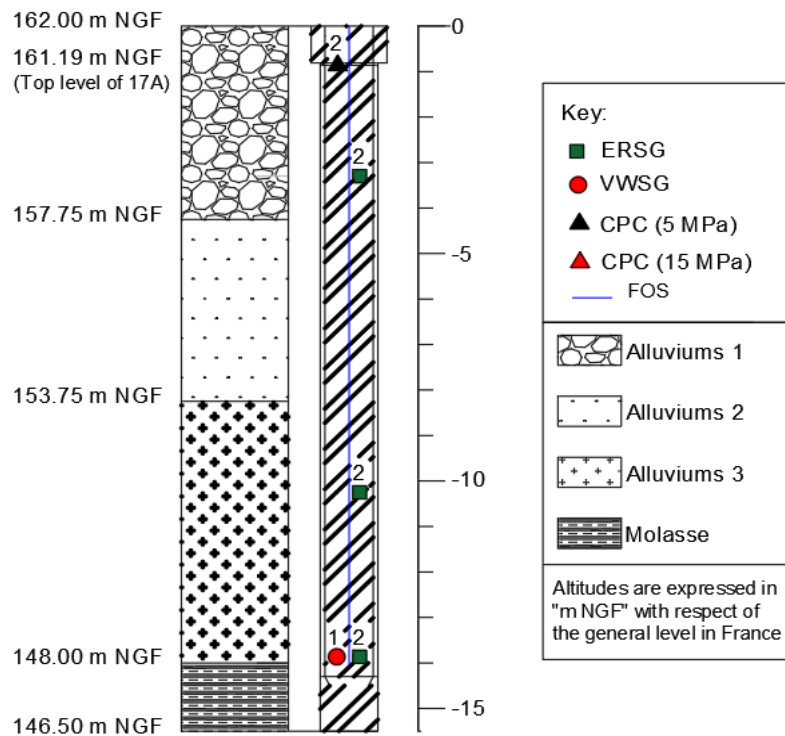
General soil profile and instrumentation layout of Pile 17A
